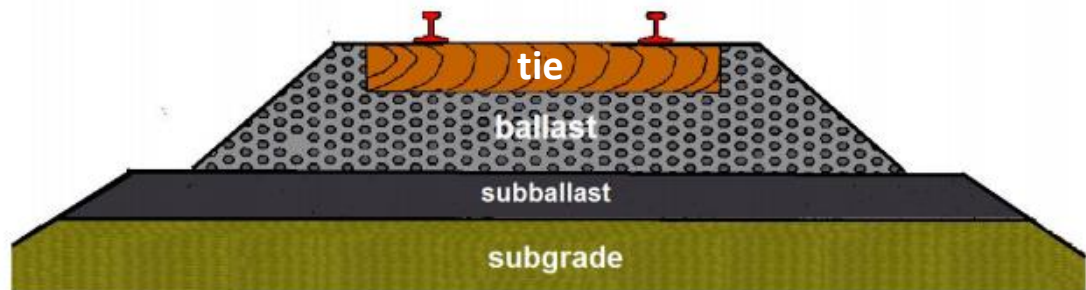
Ballasted railroad track cross-section (Rose and Lees, 2008)
